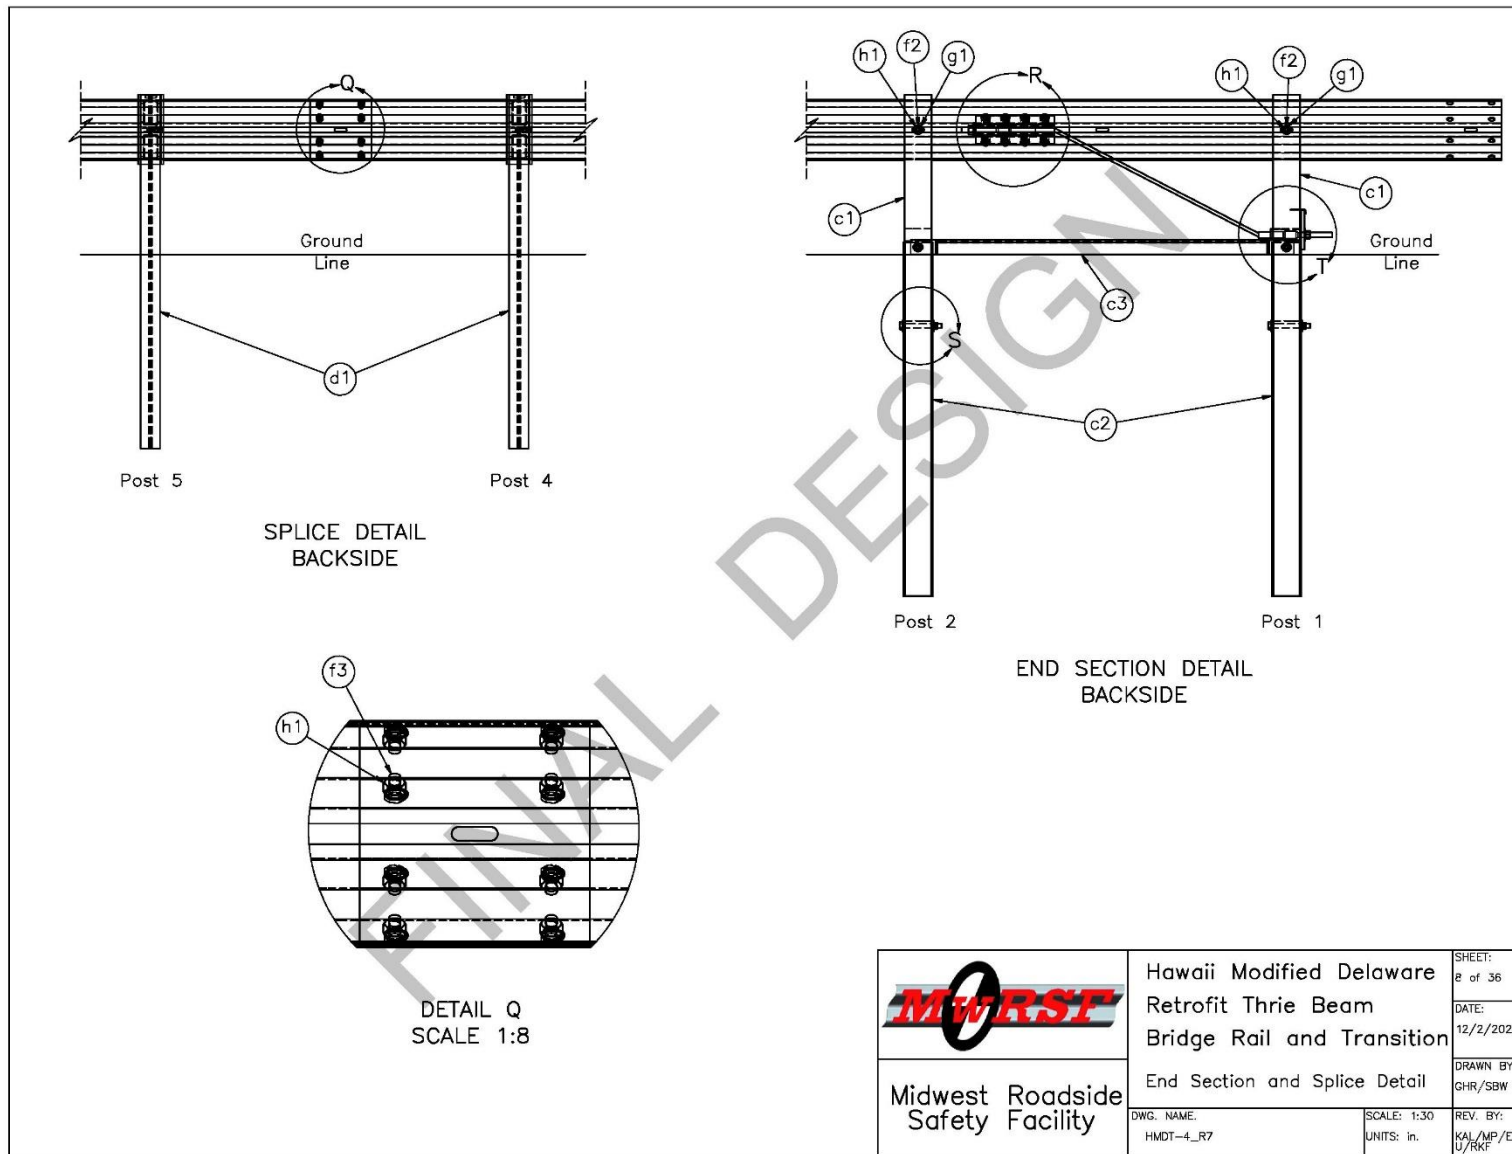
End Section and Splice Detail, Test No. HMDT-4
